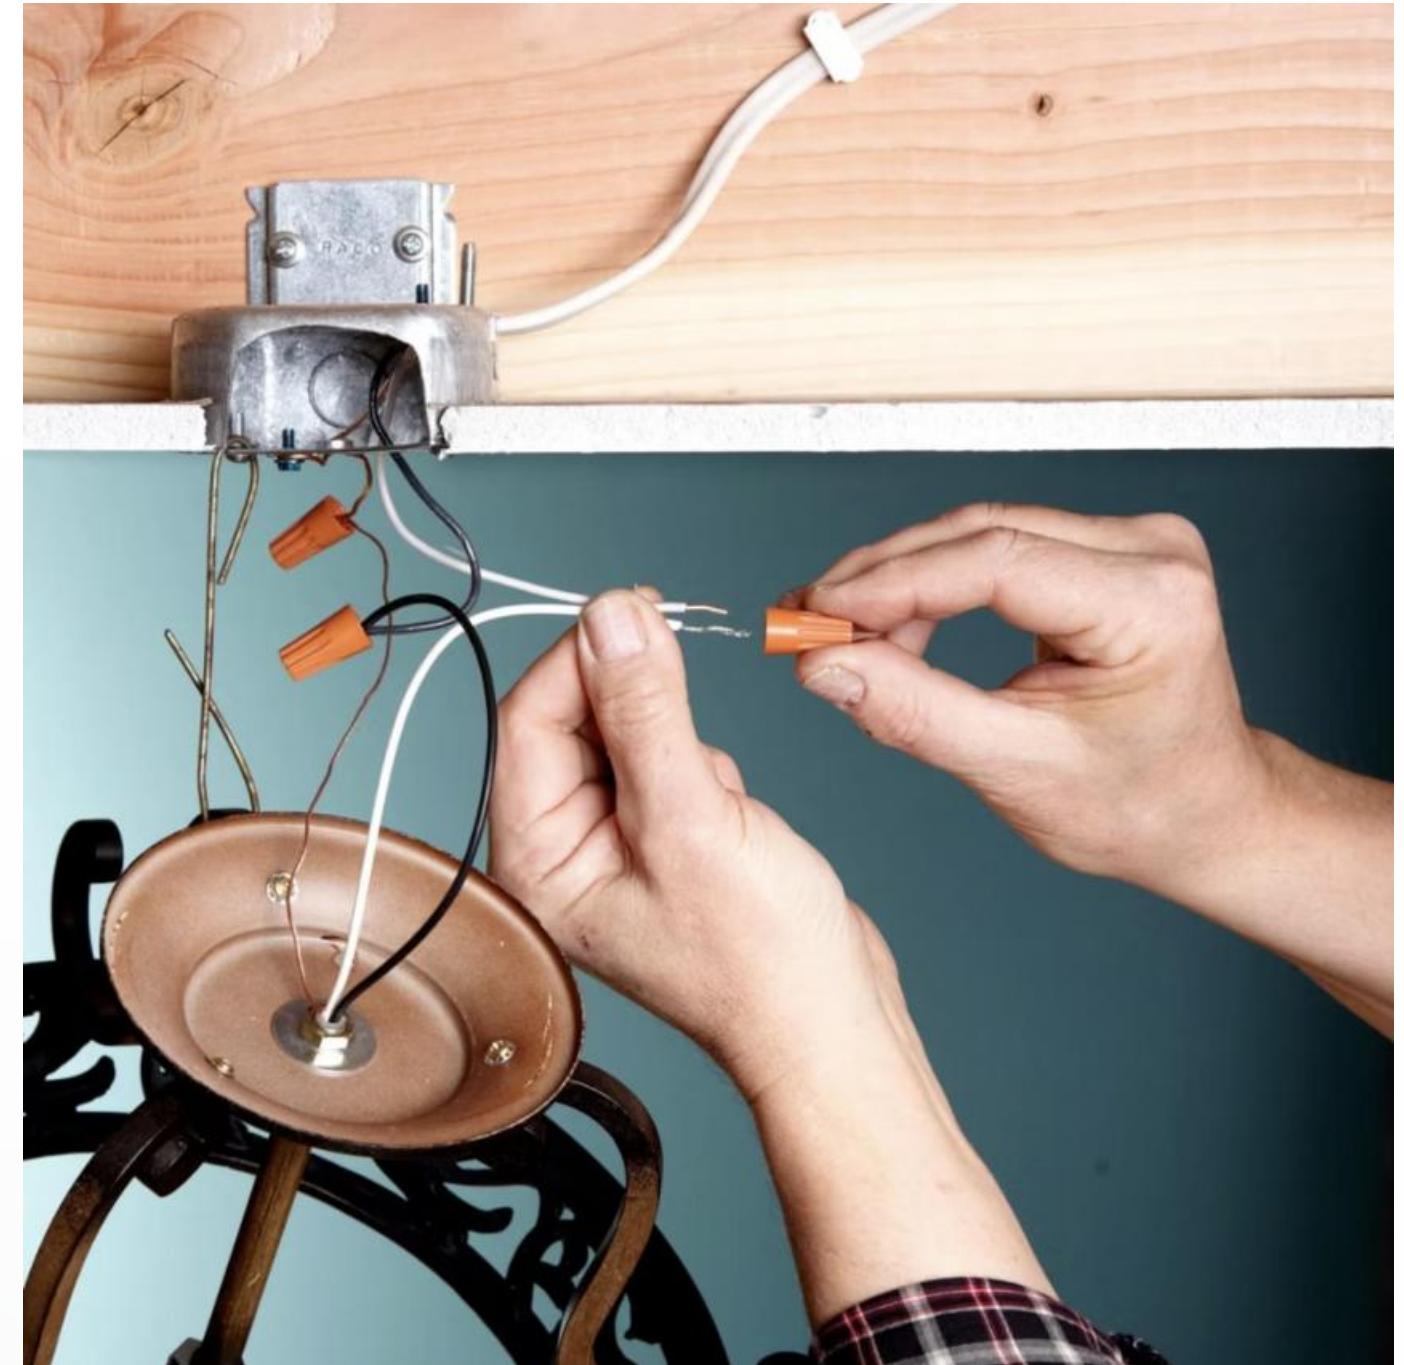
A fixture wire connects the fixture to the branch circuit conductors.
